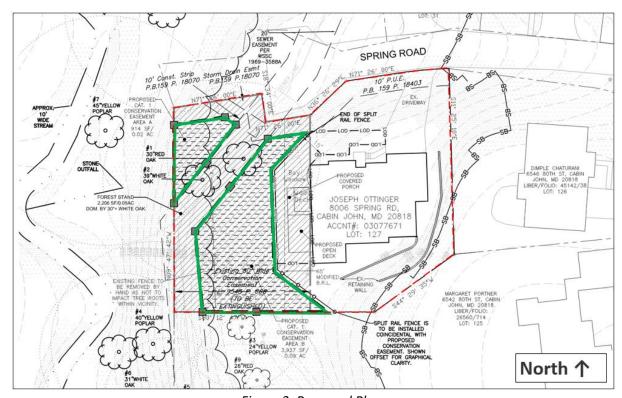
Proposed Plan (Existing easement within hatched areas-proposed easements are in green outline)
